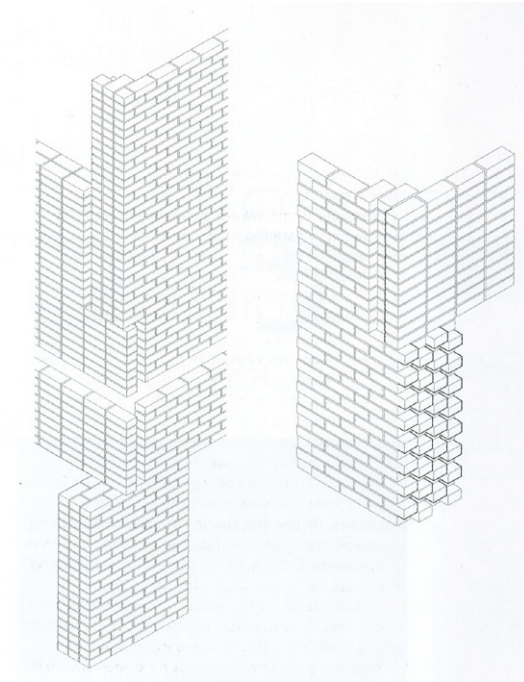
Office dA - Brick Details - Tongxian Art Center and Gatehouse
